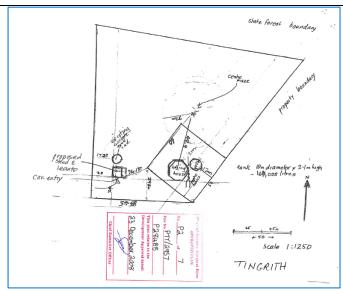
Extract from previous approval ref P28488 showing approved Guest House (referred to as a lodging house)
